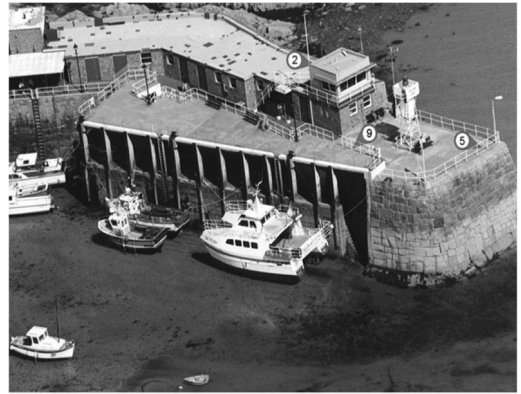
The Pierhead and concrete jetty with the main monitoring points. (The collapsed corner is at point 5).
